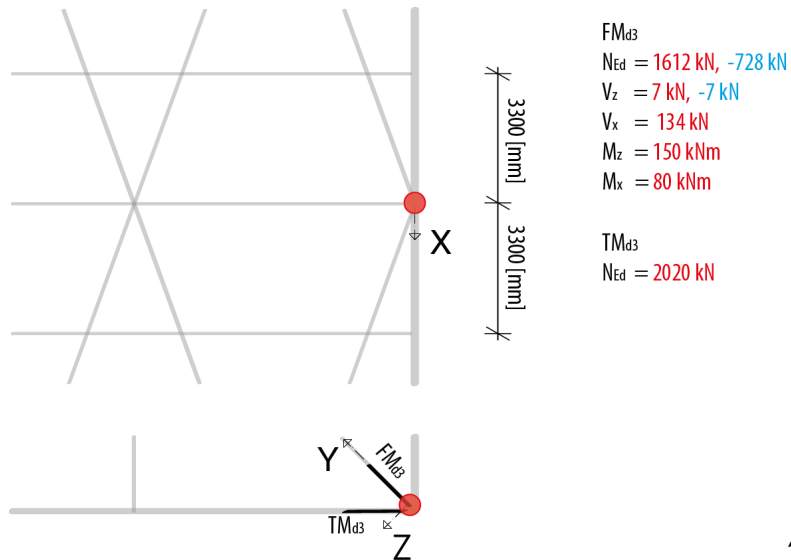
Detail 3, normative load attached floor beam (Local coordinate system)
